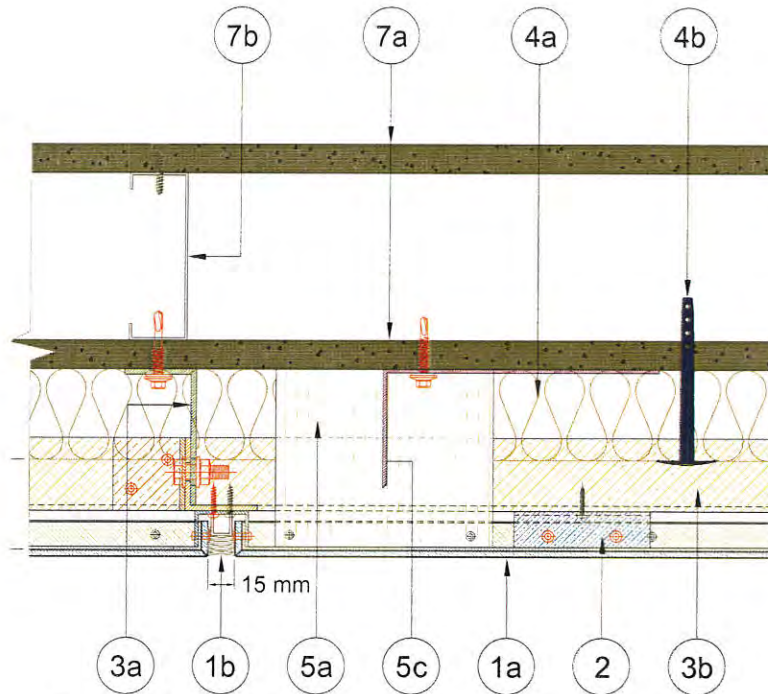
"Alstrong FR-B1" 4 mm thick Aluminium Composite Material Exterior Wall Cladding Assembly horizontal section details
